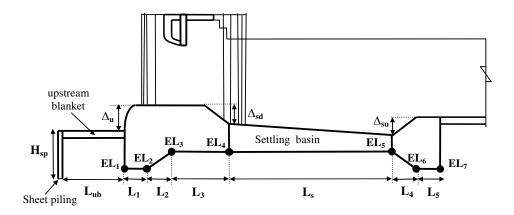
Definition sketch for the foundation dimensions of the intake and settling basin.
